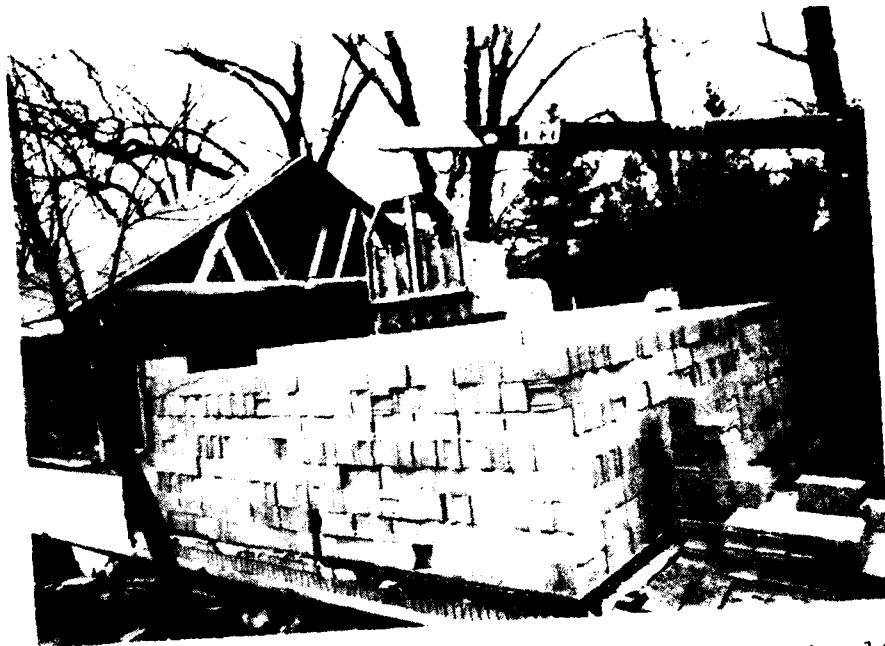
Final Load at 47 Pallets of Block, 169,600 lb
